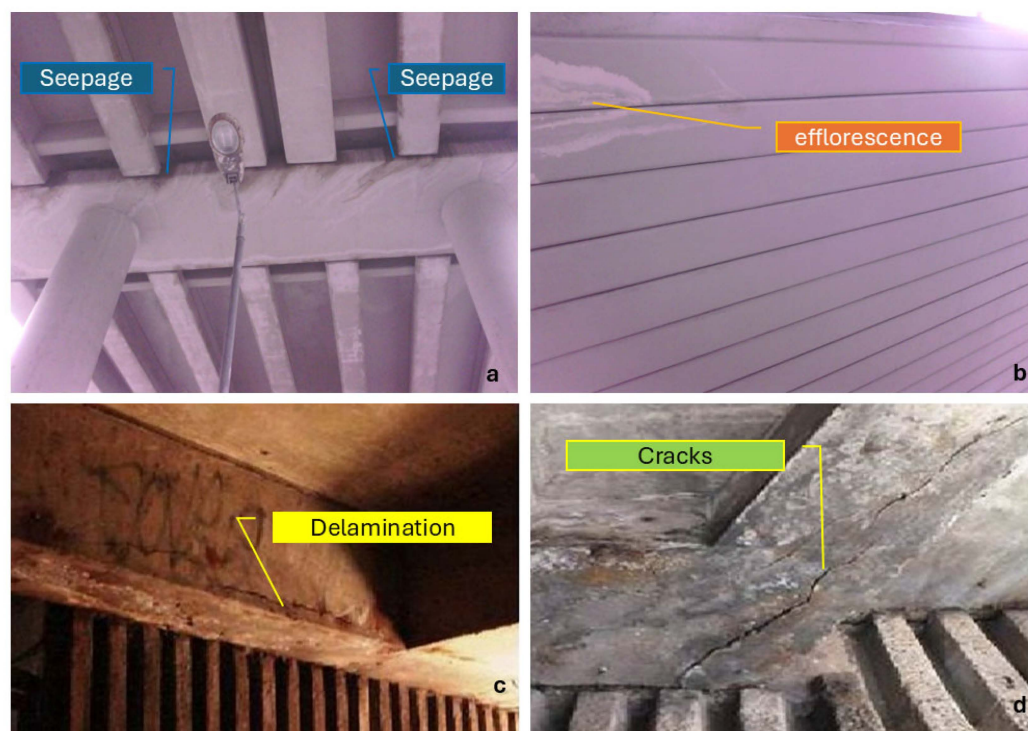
Bridge deterioration cases: (a) Seepage; (b) Efflorescence; (c) Delamination; (d) Cracks. (Reproduced from Ref. [7] Copyright (2016) Elsevier).
